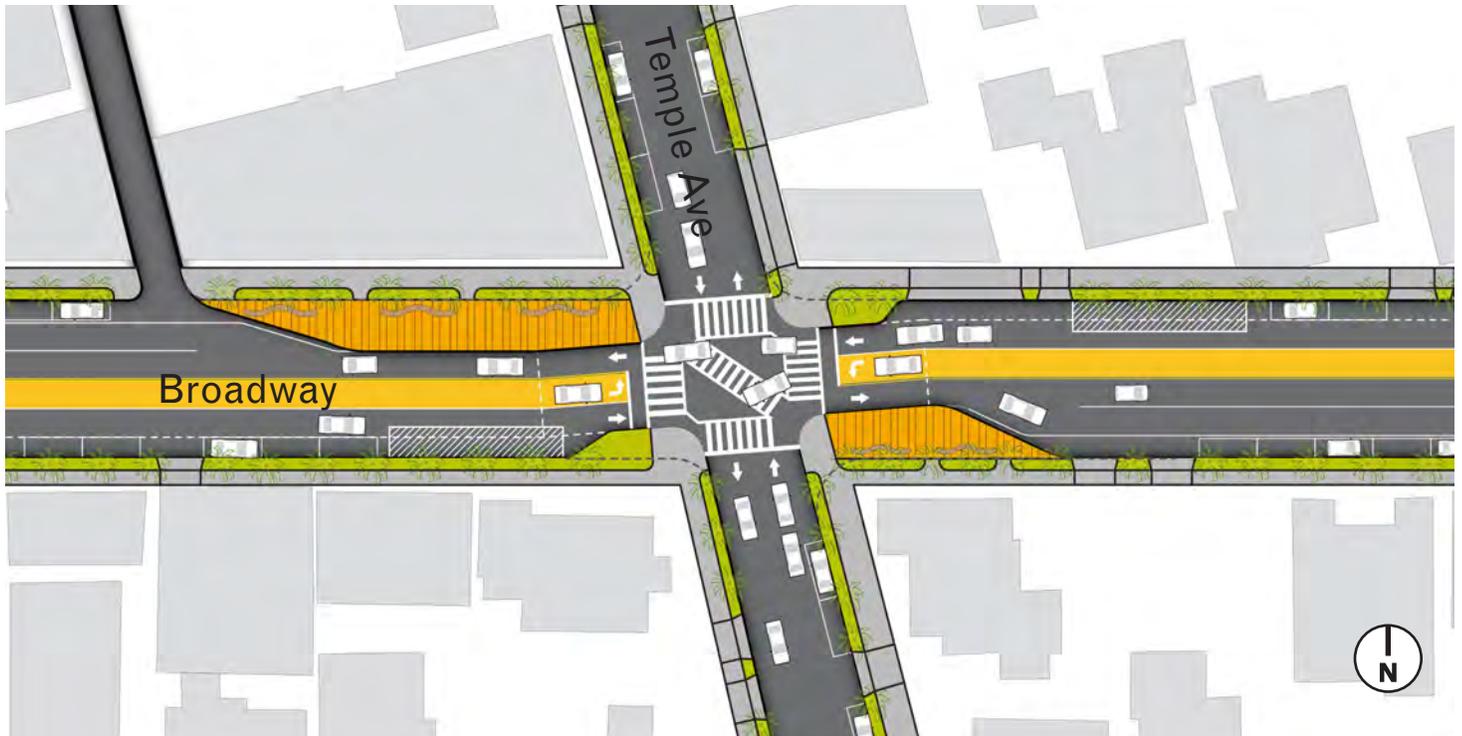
Broadway at Temple Intersection: Proposed (82 parking spaces)
